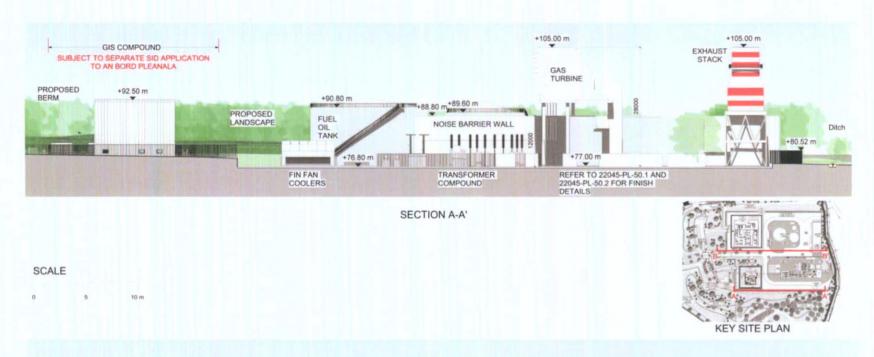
Proposed site sections AA and BB (See drawing set for full resolution versions)
